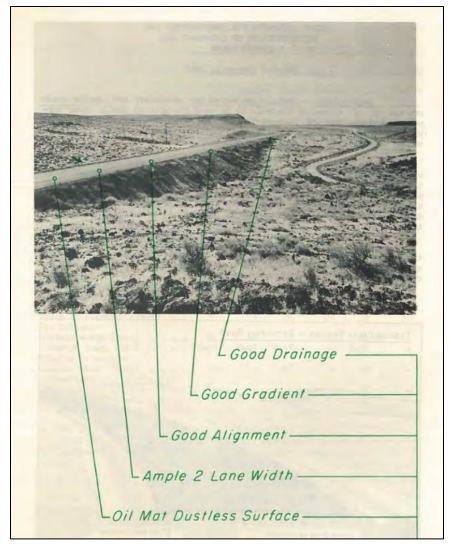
This 1953 photo shows a secondary road project, highlighting some of the typical improvements made. 405
